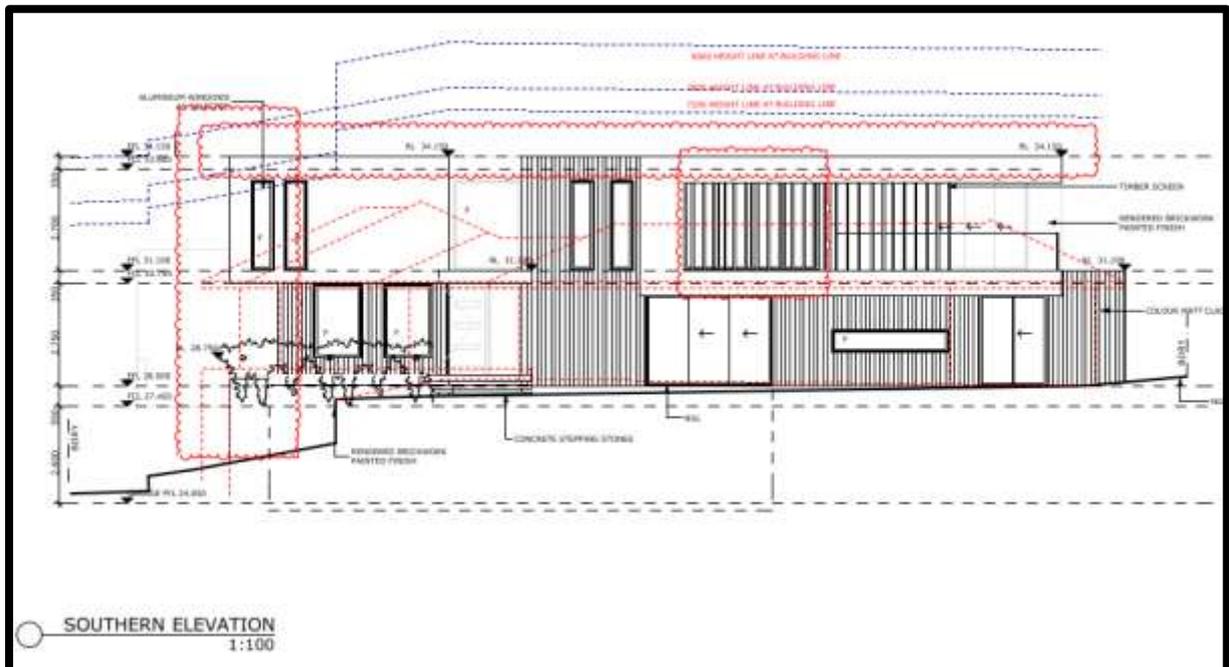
Extract Southern front elevation fronting Cross Street, Kyle Bay (Source: David Dechiara, 2020).
